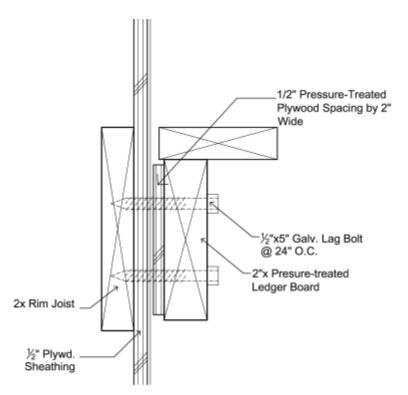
Alternate Connection Detail: ½" PT Plywood and ½" Drainage Spacers
